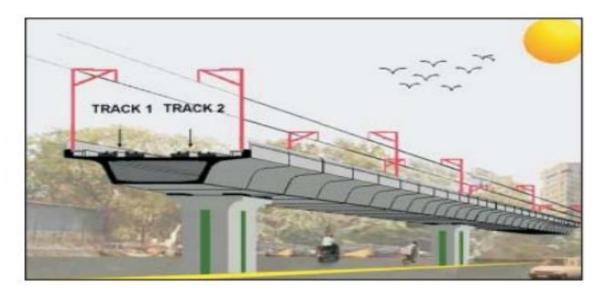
Box Girder (Precast Segmental) Supporting 2 Tracks
